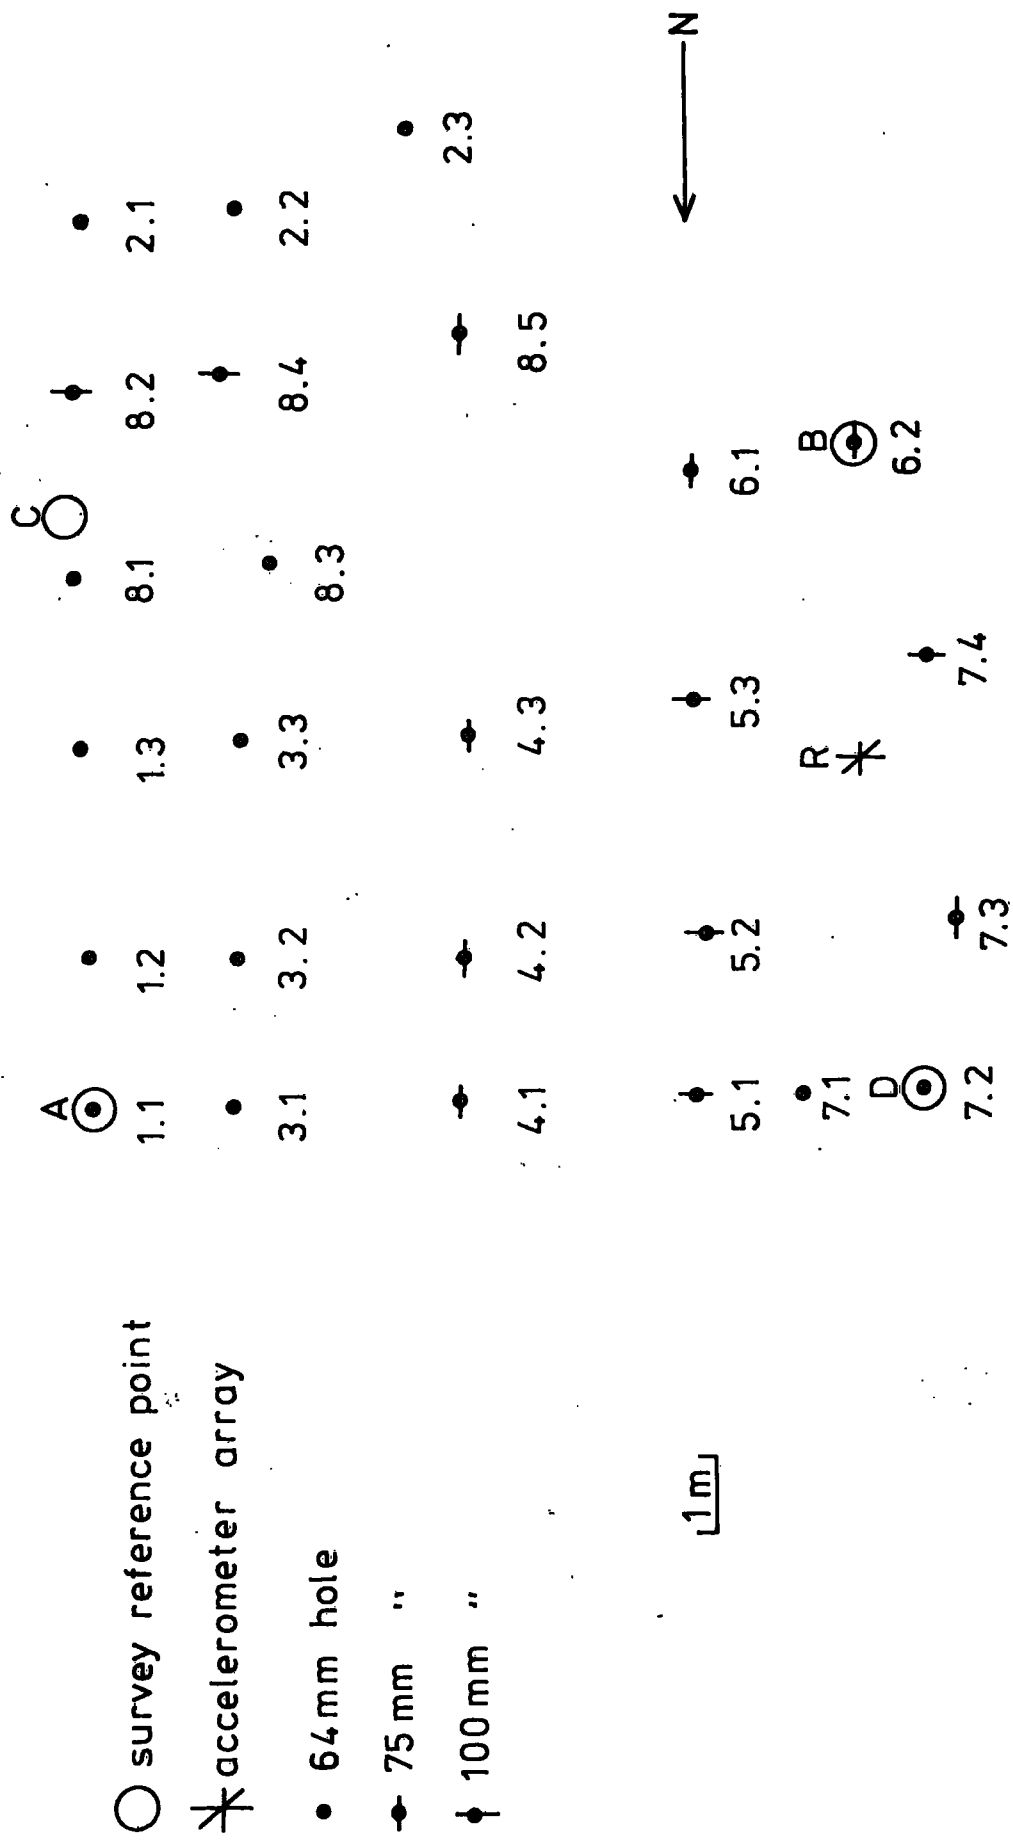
BLAST AREA DRILL-HOLE PLAN
